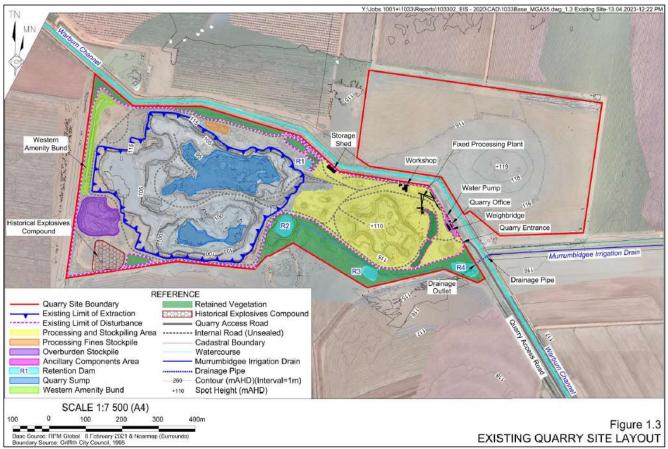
Existing Warburn Quarry Layout (Plan supplied in EIS)
